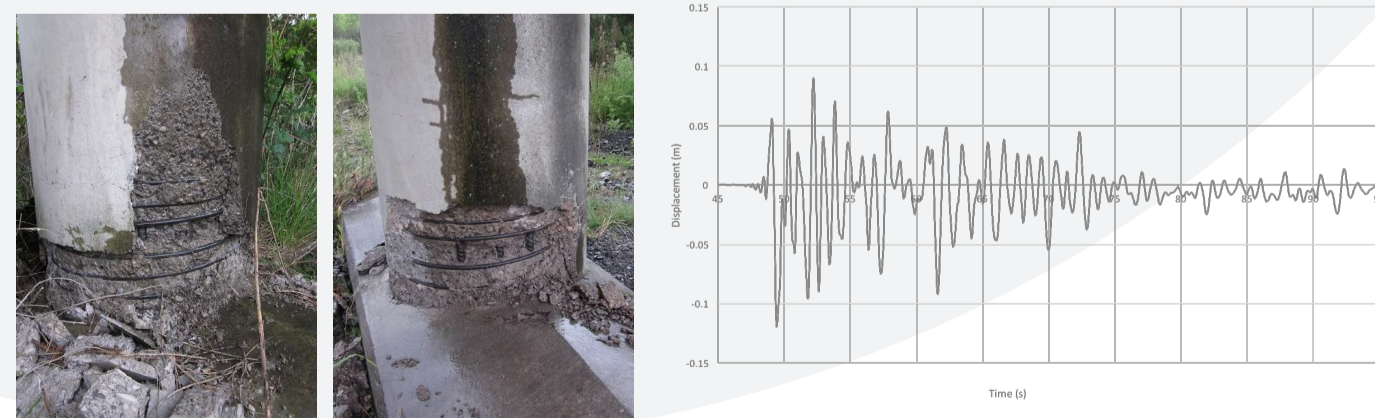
Left and Centre: Damage to river road bridge piers. Right: Displacement time history of the top of the pier at River Road bridge during Kaikoura earthquake.
